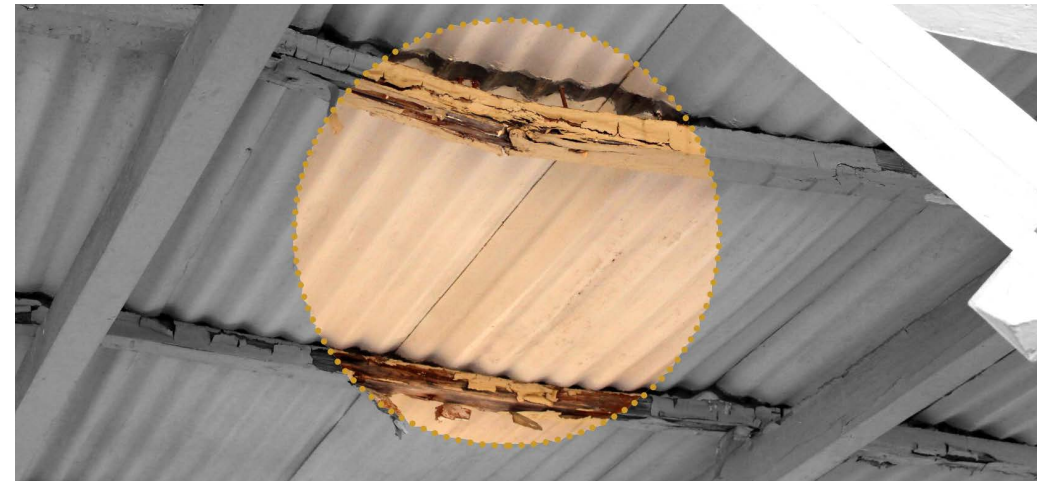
Roof purlins shows structural failure and obsolescence due to water penetration through roof sheeting. The structure needs immediate attention in this regard.
